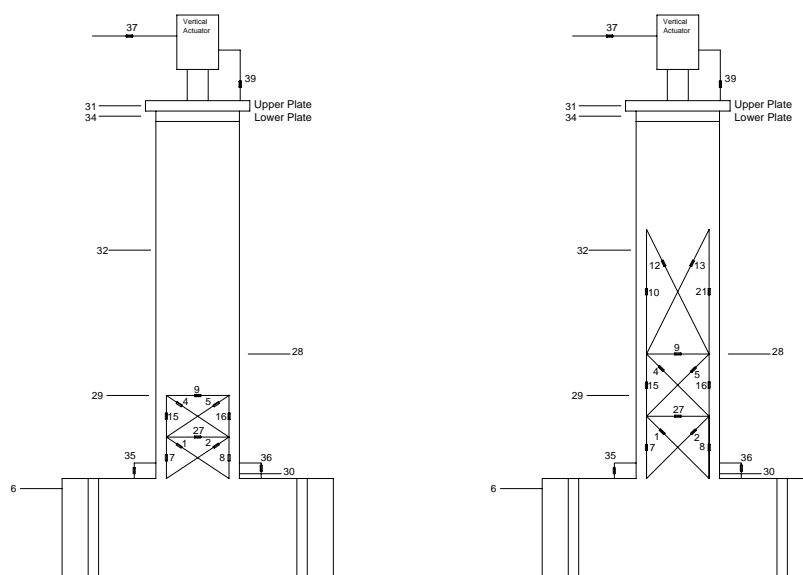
LVDT's location in the test specimens: PO1 (left) and PO2 (right)
